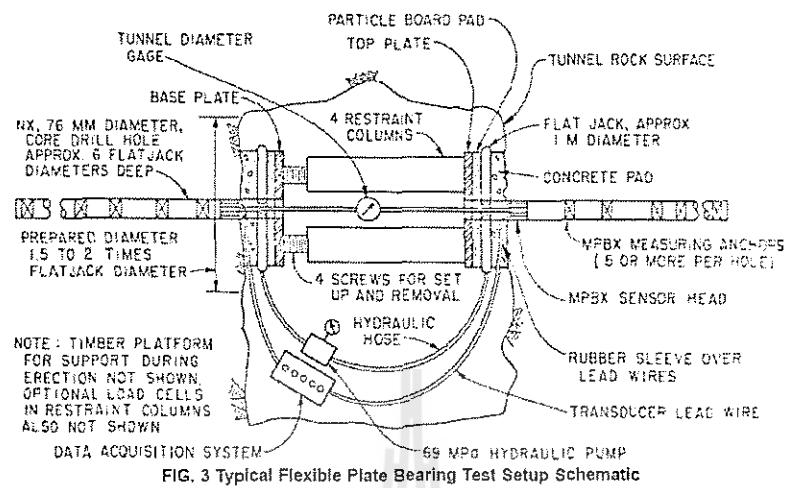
Typical Flexible Plate Bearing Test Setup Schematic
